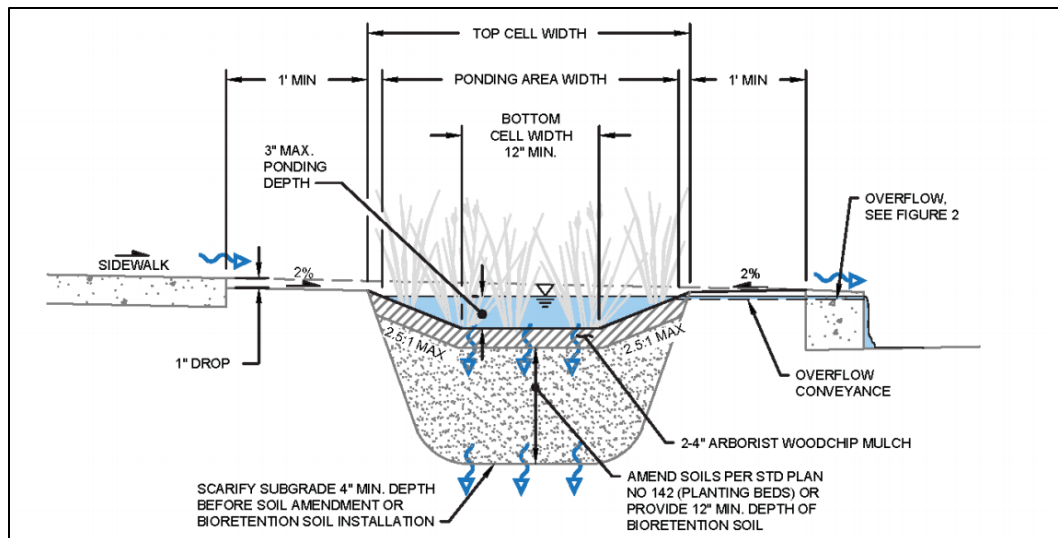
Rain garden section typical details. Source: Seattle Public Utilities Permitting Guidelines, 2016
